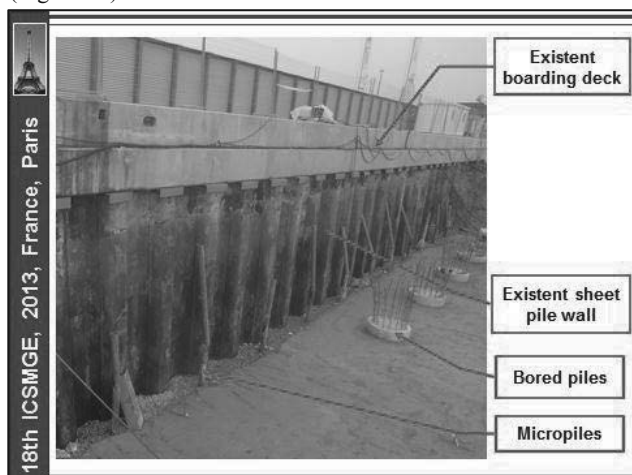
Solution T3 – view of the sheet pile wall after excavation.
